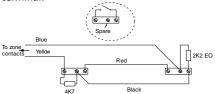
Example: Wiring Two Door Contacts to One FSL Zone.
